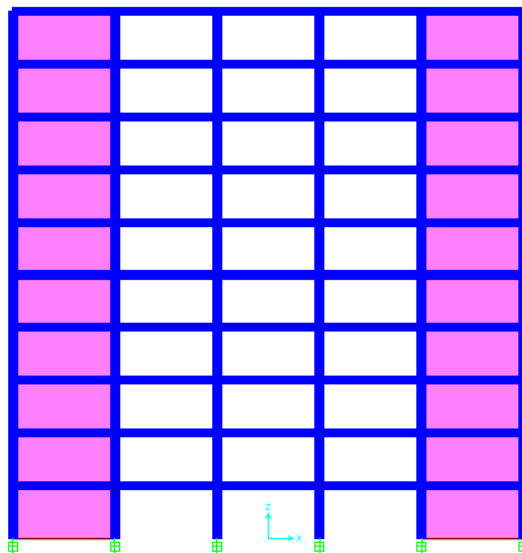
2D Model of 10 Storey with Lead Rubber Bearing with Shear Wall.
